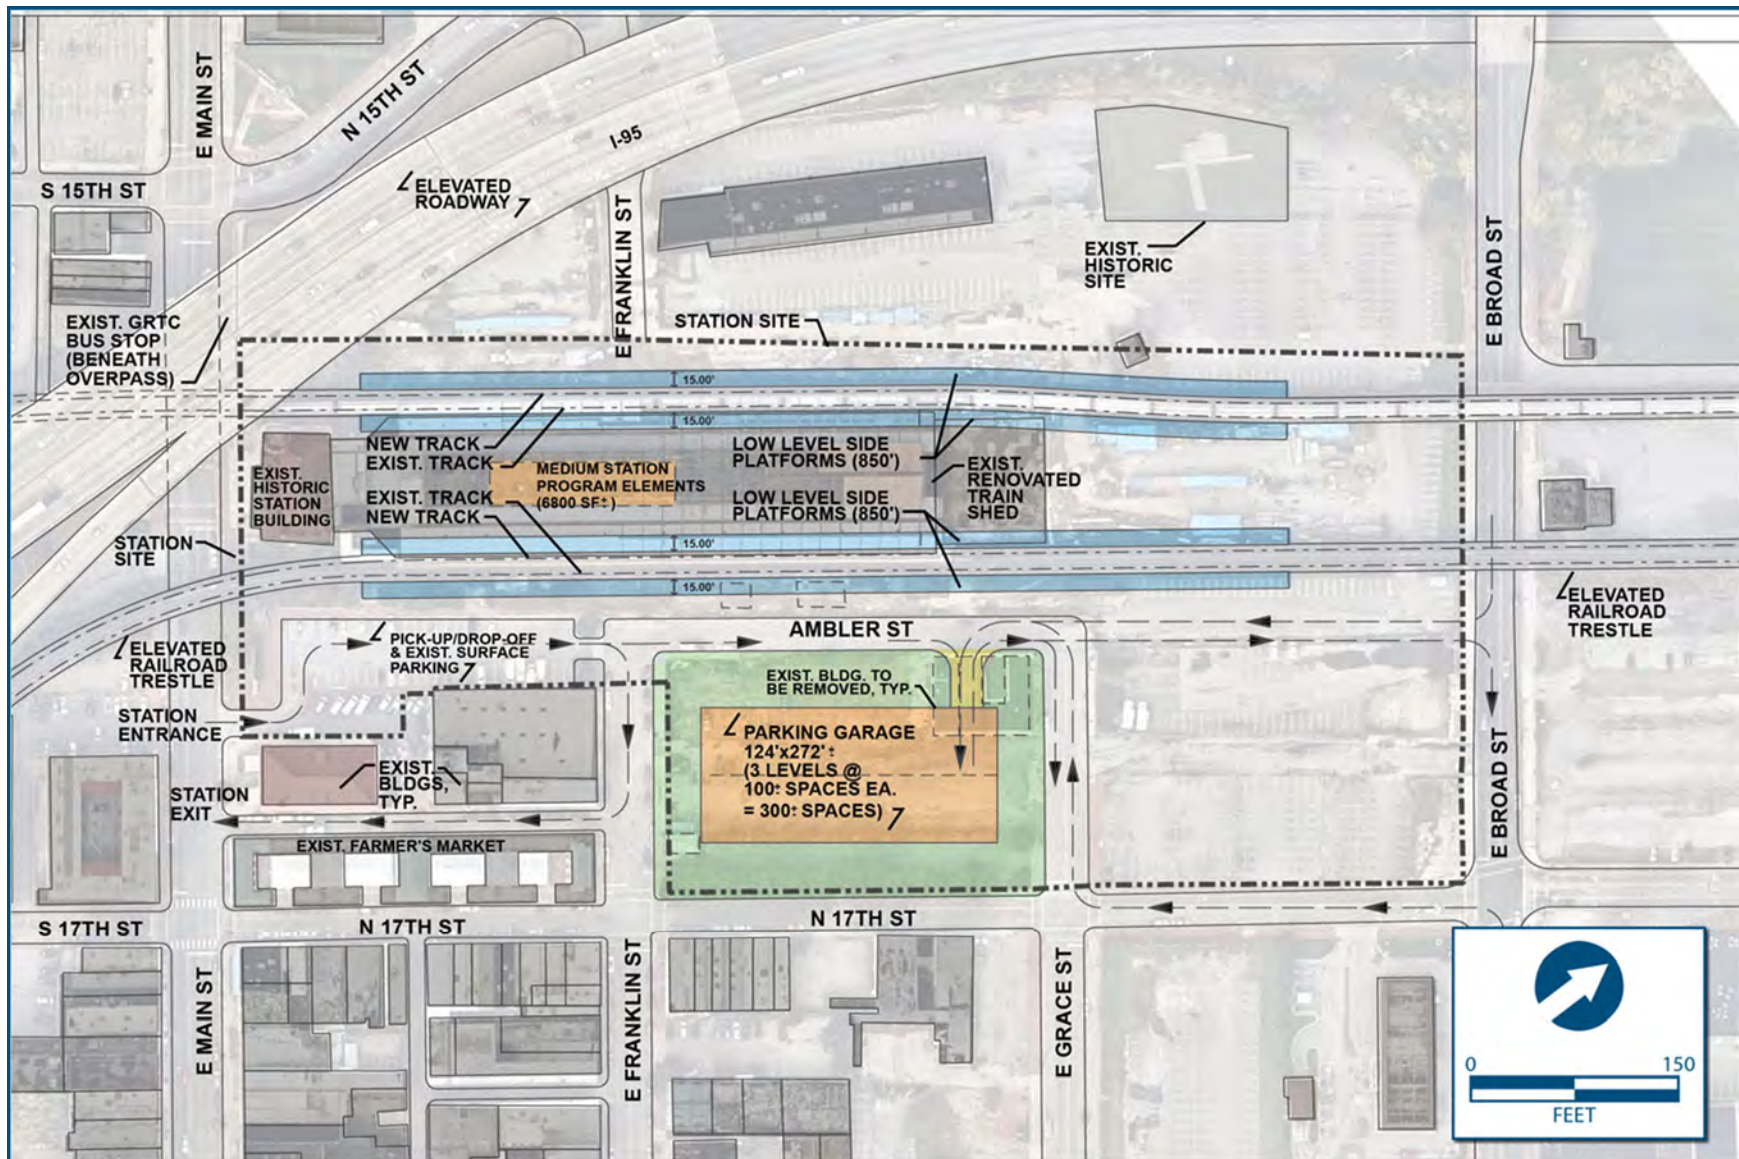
Main Street Station Improvements for Build Alternative 6F
